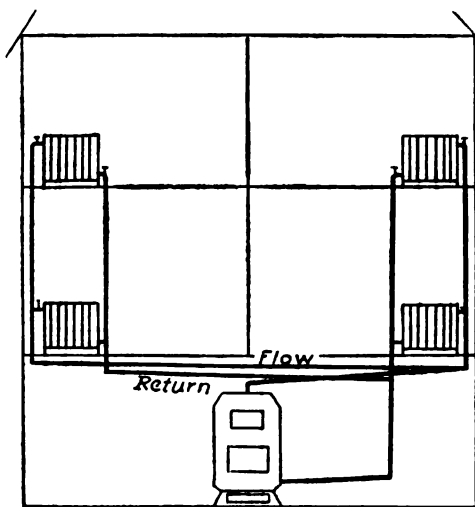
Two-pipe steam heating system in which a second set of valves and pipes are employed to return the condensed steam to the boiler.
